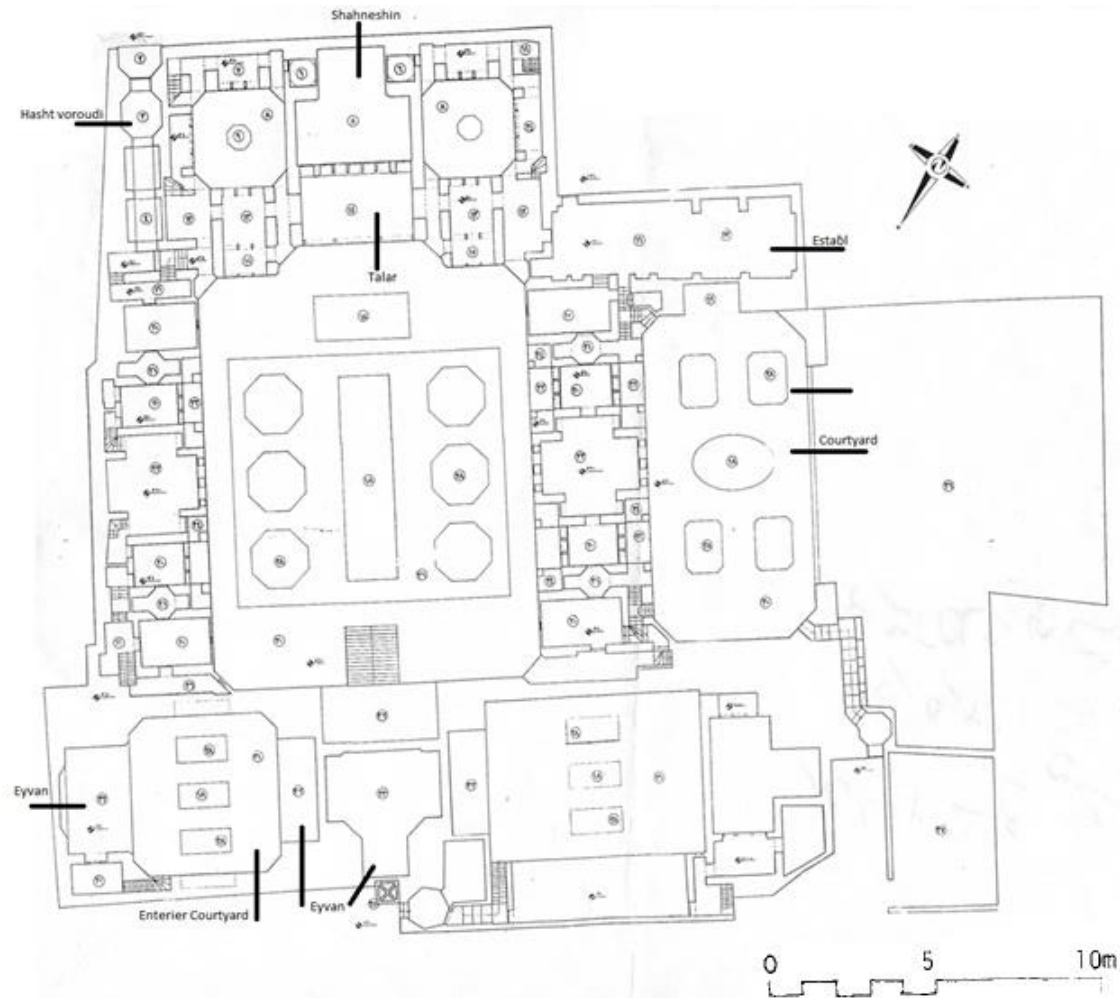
Tabatabaee House (Basement Floor Plan) Kashan (URL 16)
